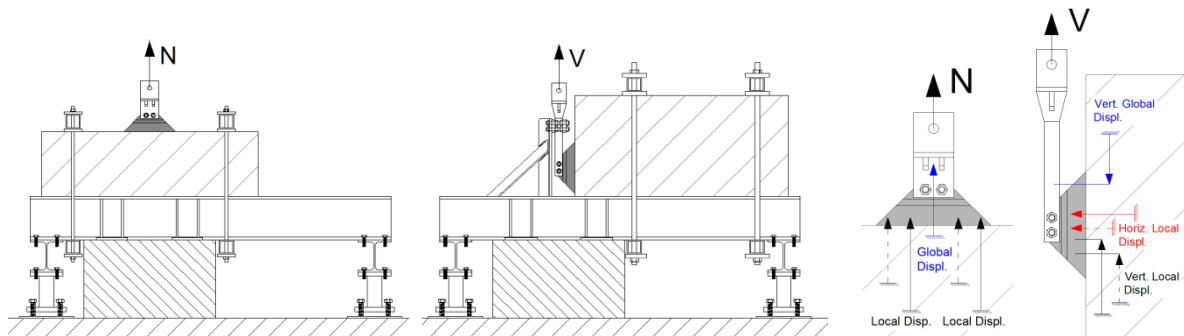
Setup adopted for tension and shear configuration (left) and instrumentation (right)
